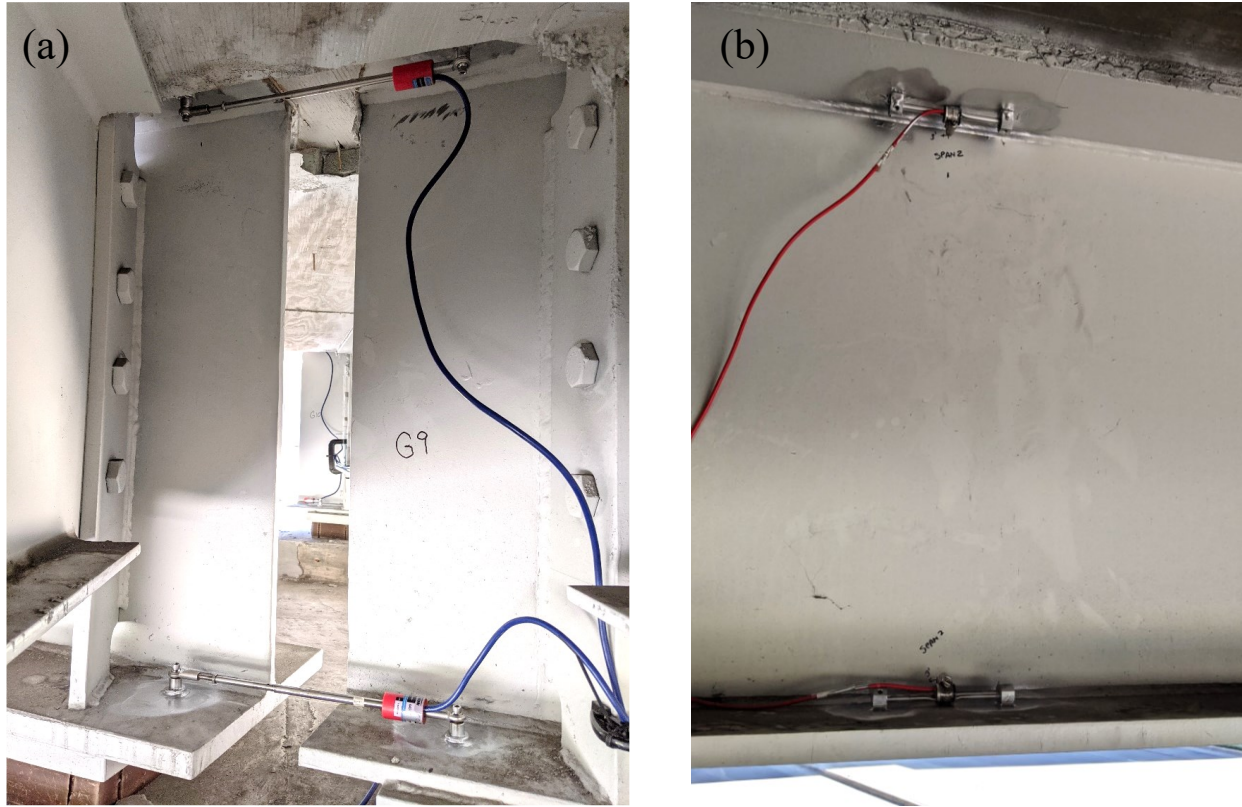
Photos of Installed (a) Displacement Gauges and (b) Strain Gauges near the Pier.
